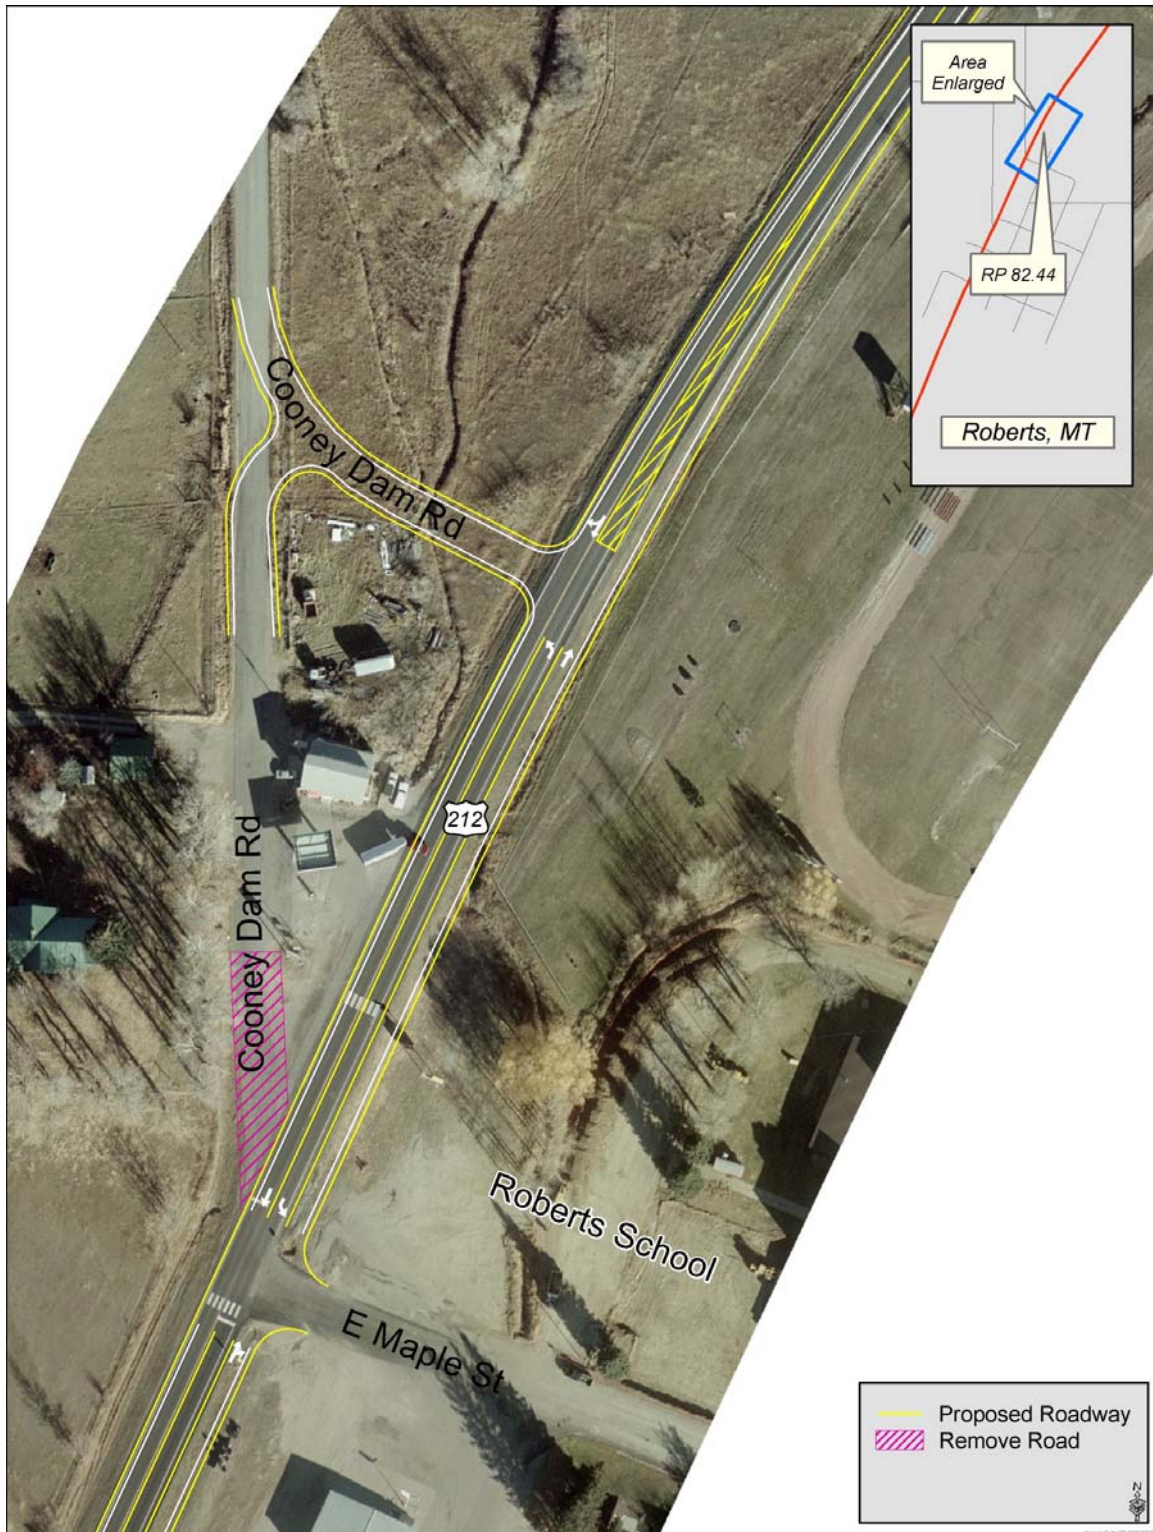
, Cooney Dam Road Intersection (near East Maple Street)
